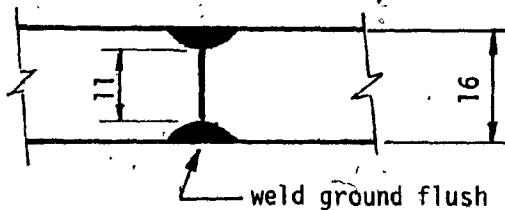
PARTIAL PENETRATION STIFFENER WELD
